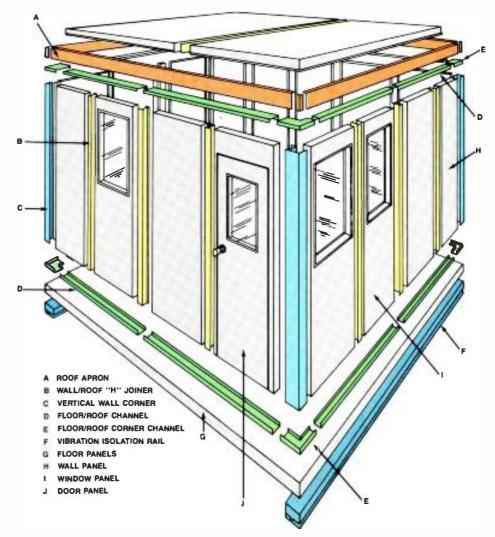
Exploded pictorial view of a typical modular room. Floor panels (G) are usually of tongue-in-groove design. Floor/roof channels (D), corner channels (E) and joiners (B) are all precut to size, Some manufacturers use tongue-and-groove for wall panels as well, thus eliminating joiners. (Courtesy of Acoustic Systems.)
